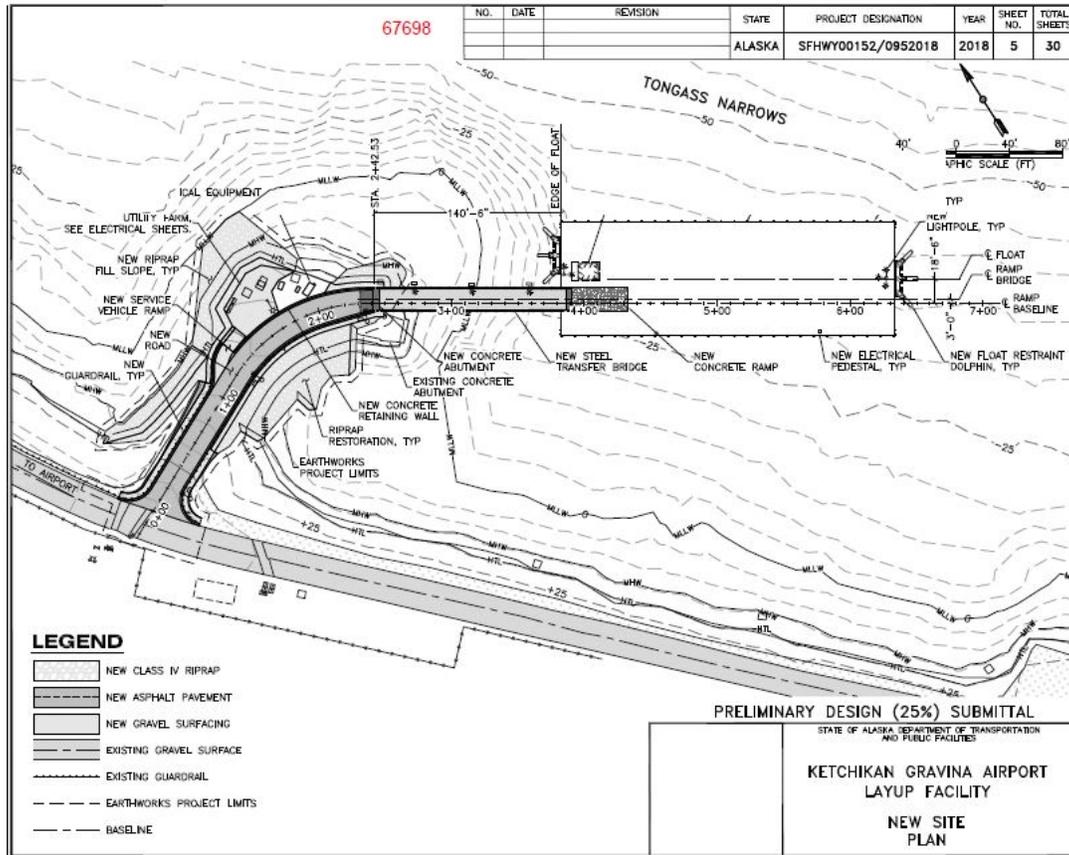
Plan drawing for improvements to the Gravina Island Airport Ferry Layup Dock (Phase 1, Component 3)(HDR 2018b).
